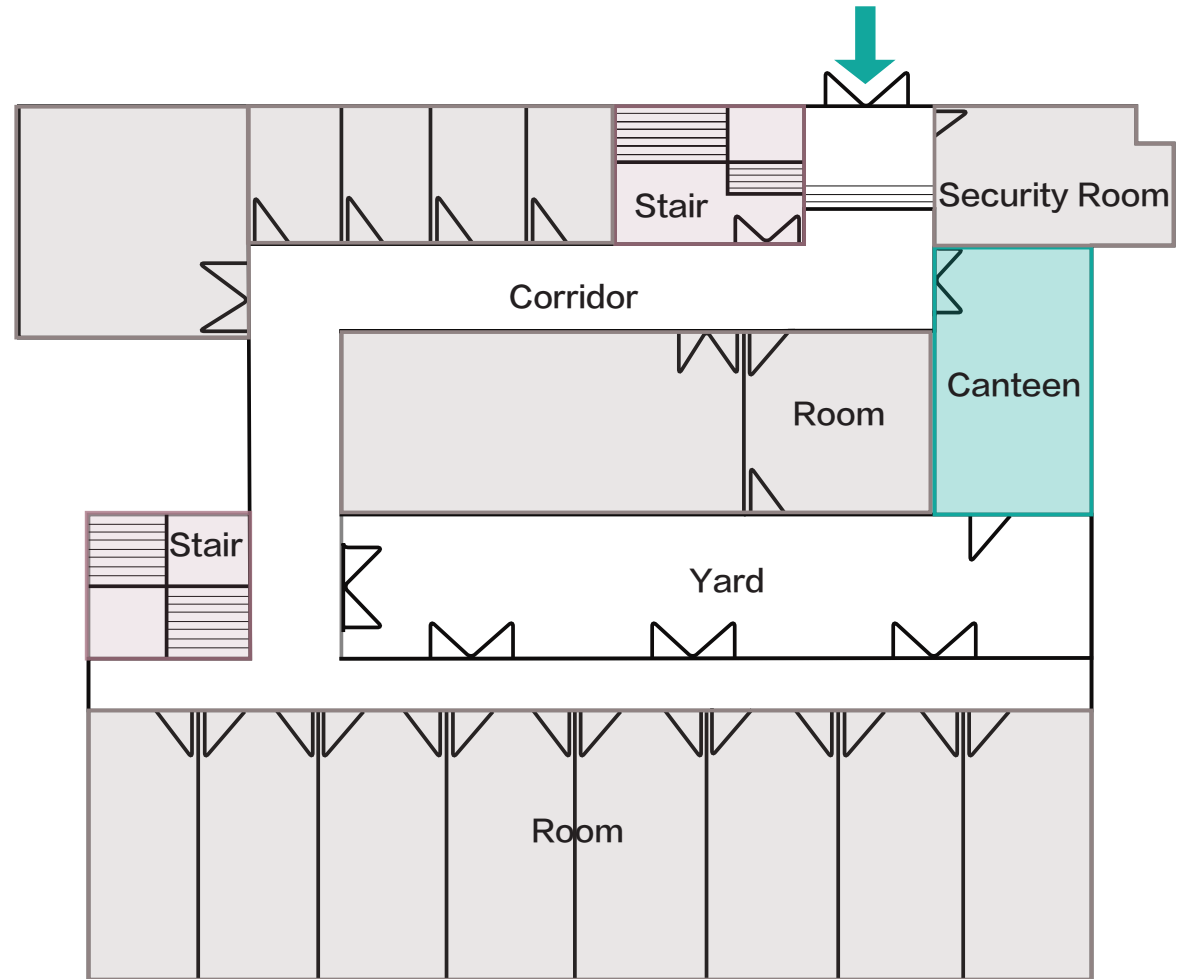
1F\_floor plan of the Si Ping Jing Lao Yuan
